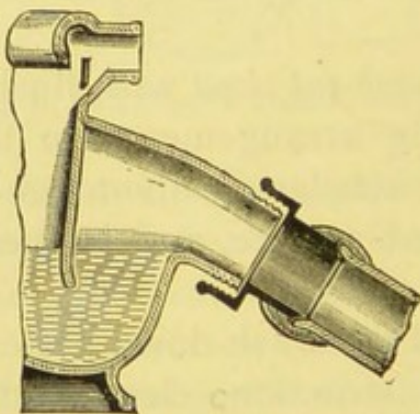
Showing method of connecting stoneware trap with lead soil pipe.
